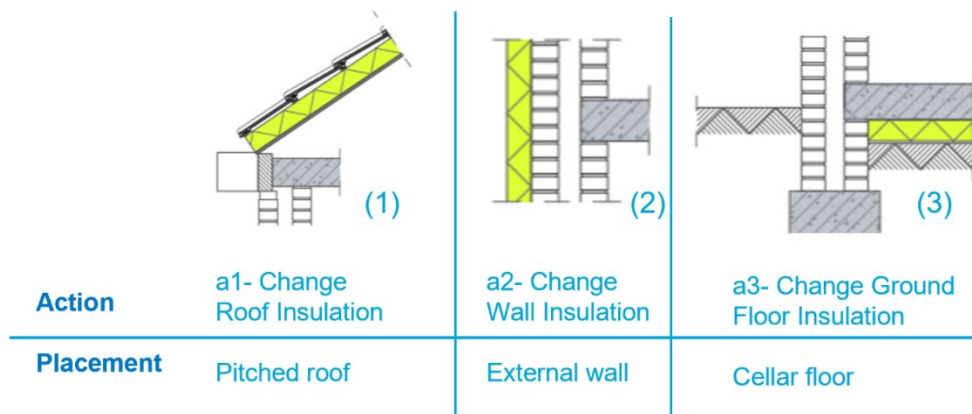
Details of insulation placement on roof, exterior wall and ground floor , taken from (Sewnath, 2024)
